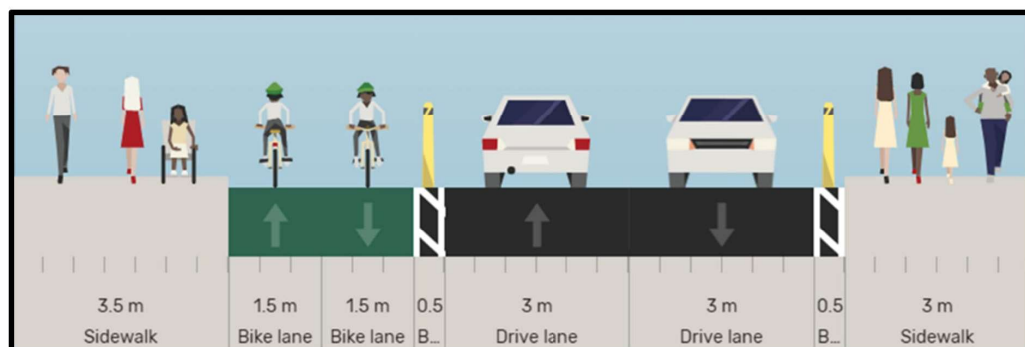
CROSS SECTION WIDTH TO ACCOMMODATE ALL MODES
